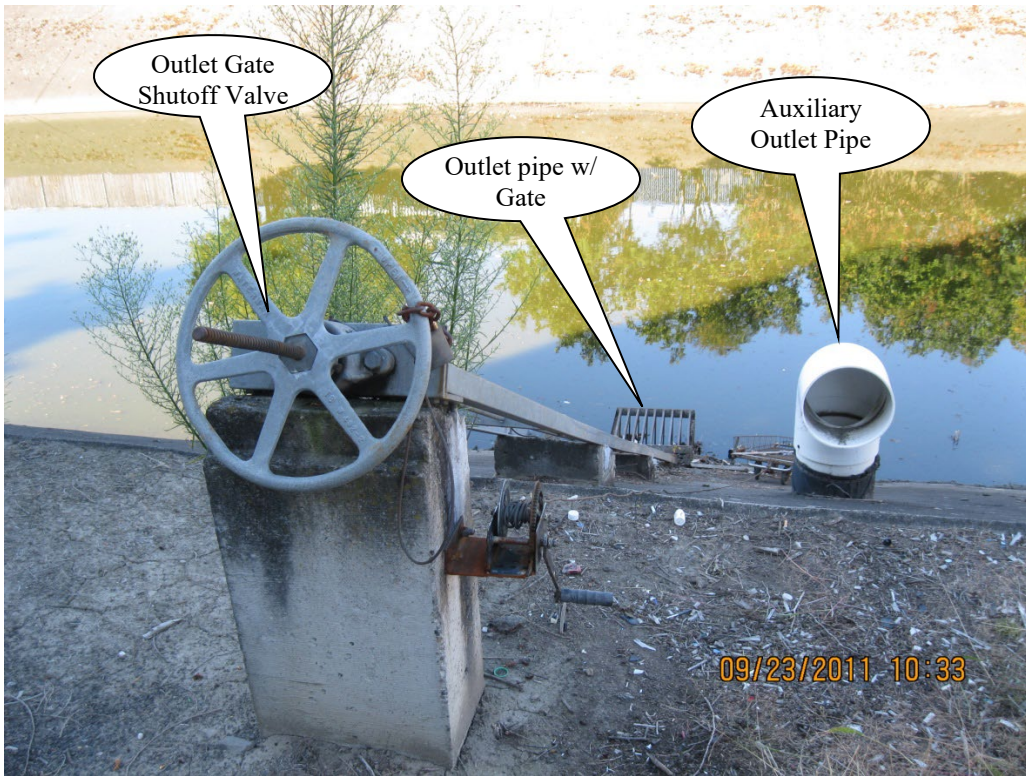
Outlet gate shutoff valve and auxiliary outlet pipe.
